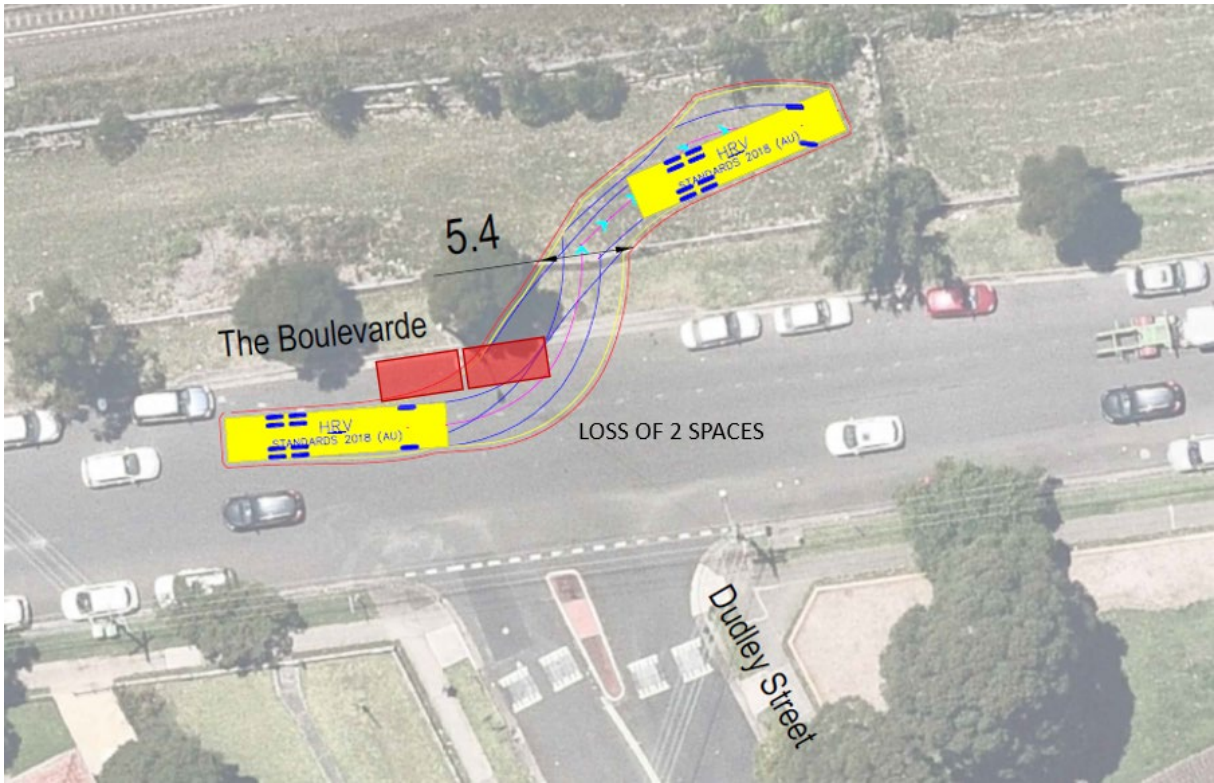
WP7 – M24 16.050D Parking Space Loss
